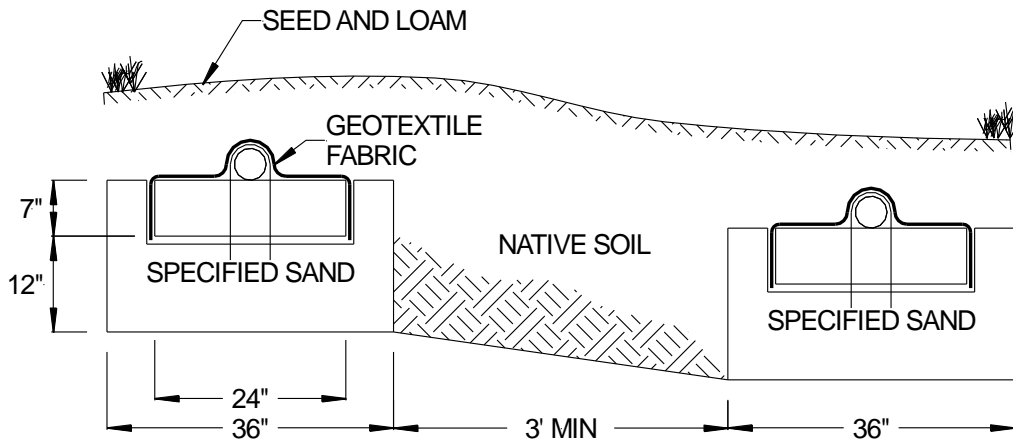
SECTION VIEW – TRENCH SYSTEM – SLOPING SITE
